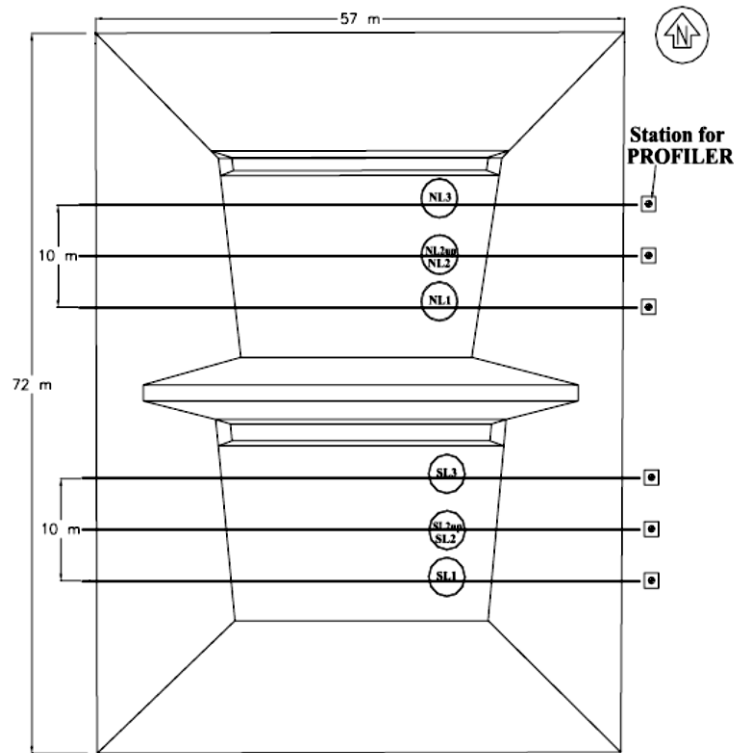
Plan of Tehran Pilot Scale Landfill Illustrating the Position of HDPE Pipes for Profilers
